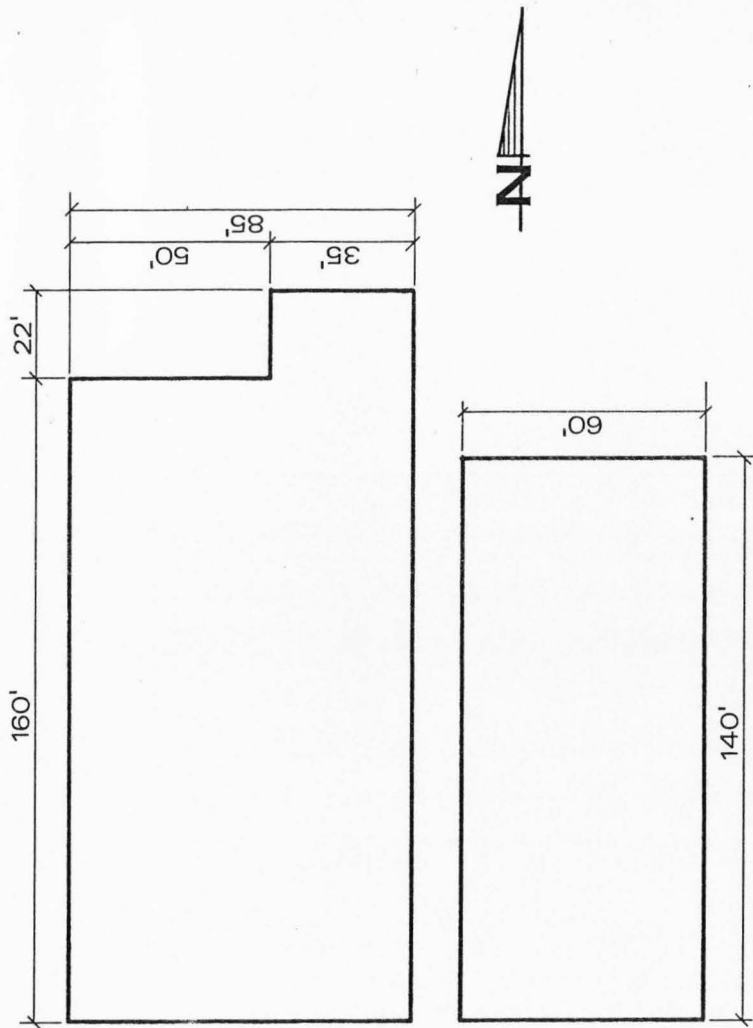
Proposed East High School Vocational Shop Addition, upper floor
